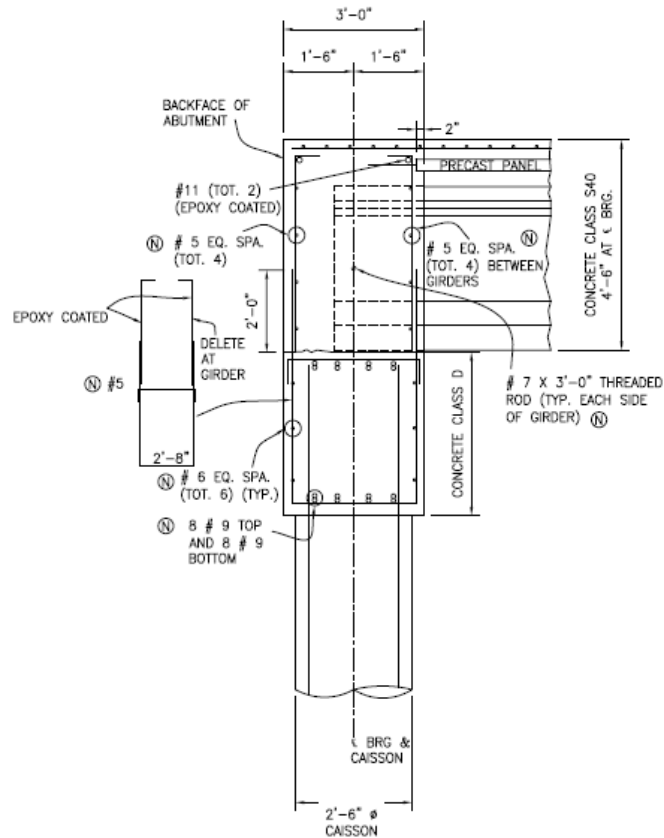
Typical integral abutment layout (CDOT see Appendix A)
